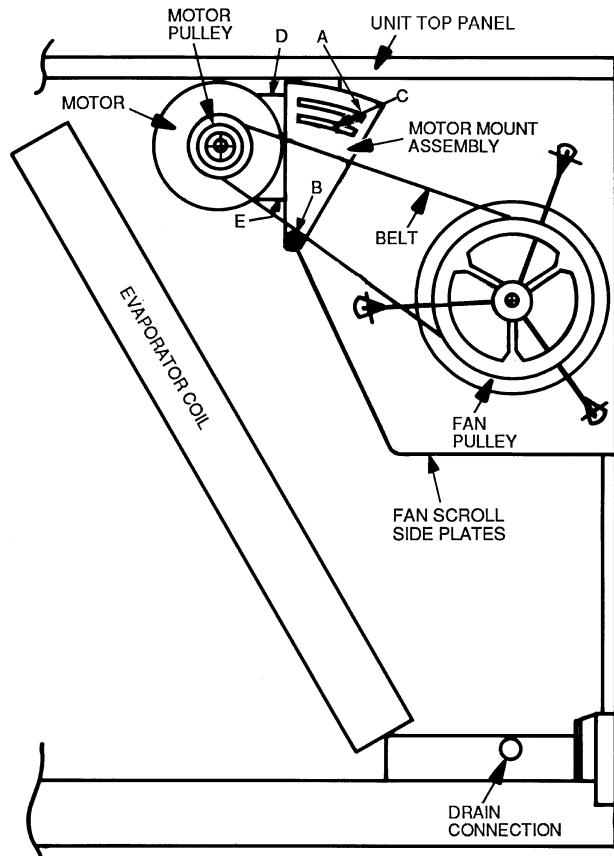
48TJ016 Evaporator-Fan Motor Adjustment
